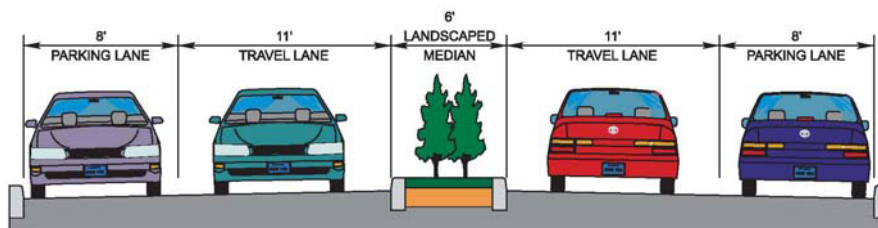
depicts the proposed typical section for A Street between New Castle Avenue and Christina Avenue. This section consists of two travel lanes separated by a narrower landscaped median with parking lanes on both sides of the roadway. It is imperative that this section include parking lanes due to the residential and commercial land uses along this segment of A Street.
